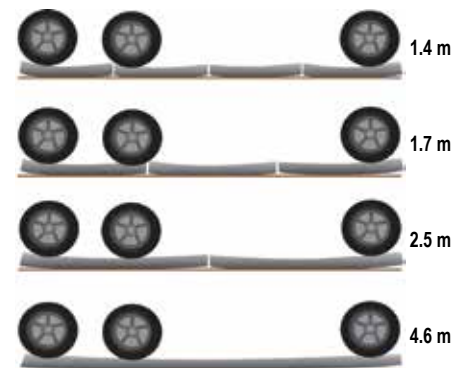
Thin concrete pavements (TCPs) are achieved by ensuring that panels are loaded by only one wheelset at a time
